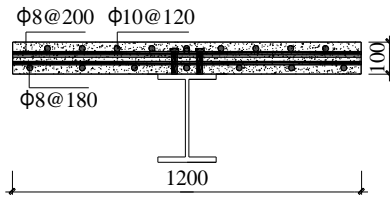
Arrangement of steel bars in the concrete floor slabs (in mm)
